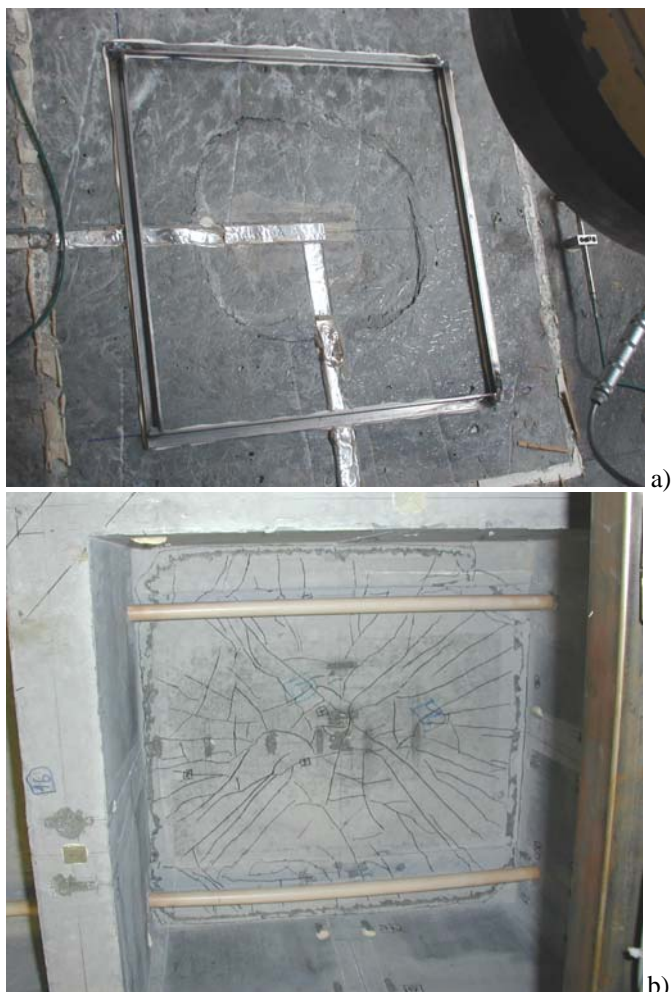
Punching shear failure. Zone N5N6. a) Top side. b) Bottom side.
